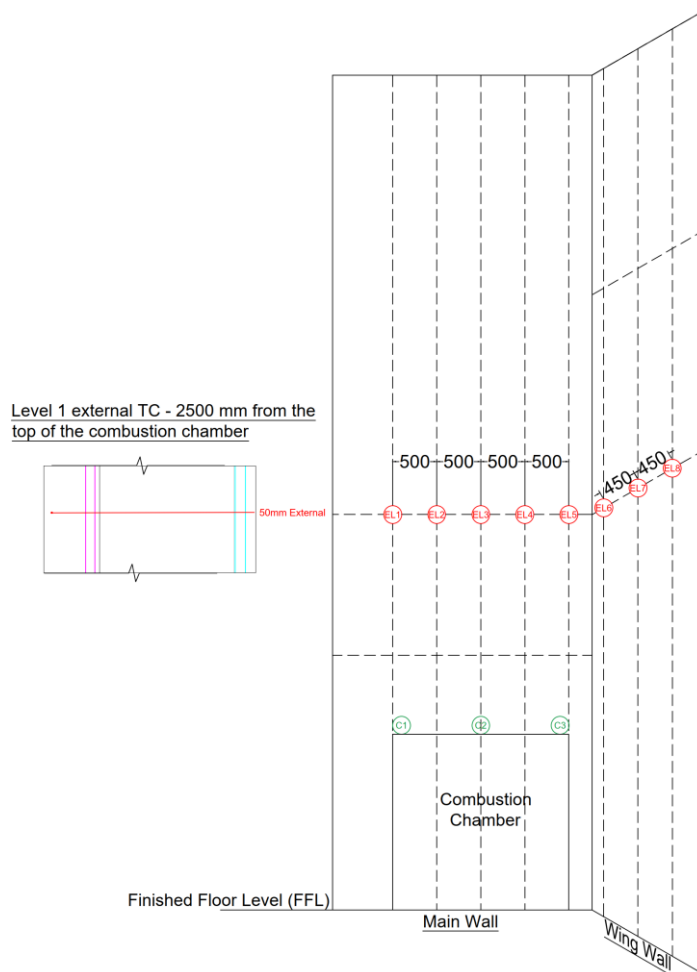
Thermocouple locations, external thermocouples and combustion chamber
